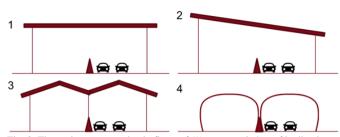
The variants: a completely flat roof (1), a monopitch roof inclined at an indeterminate angle (2), a gable roof inclined at an indeterminate angle (3) and a roofing with an arched cross-section (4) [2].
